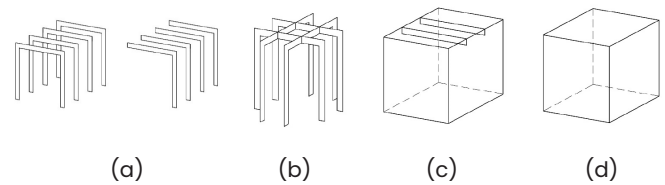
Structural systems used in all-glass buildings (Jóźwik, 2022).
